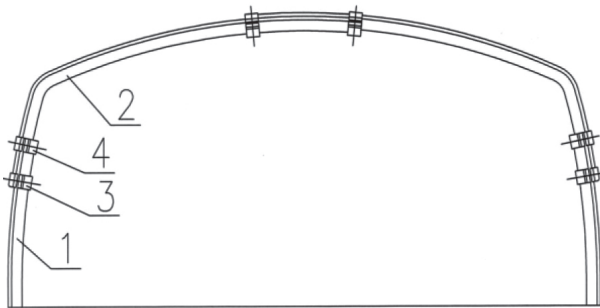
Four-element ŁPrP frame: 1 – side section, 2 – top section, 3, 4 – shackles
